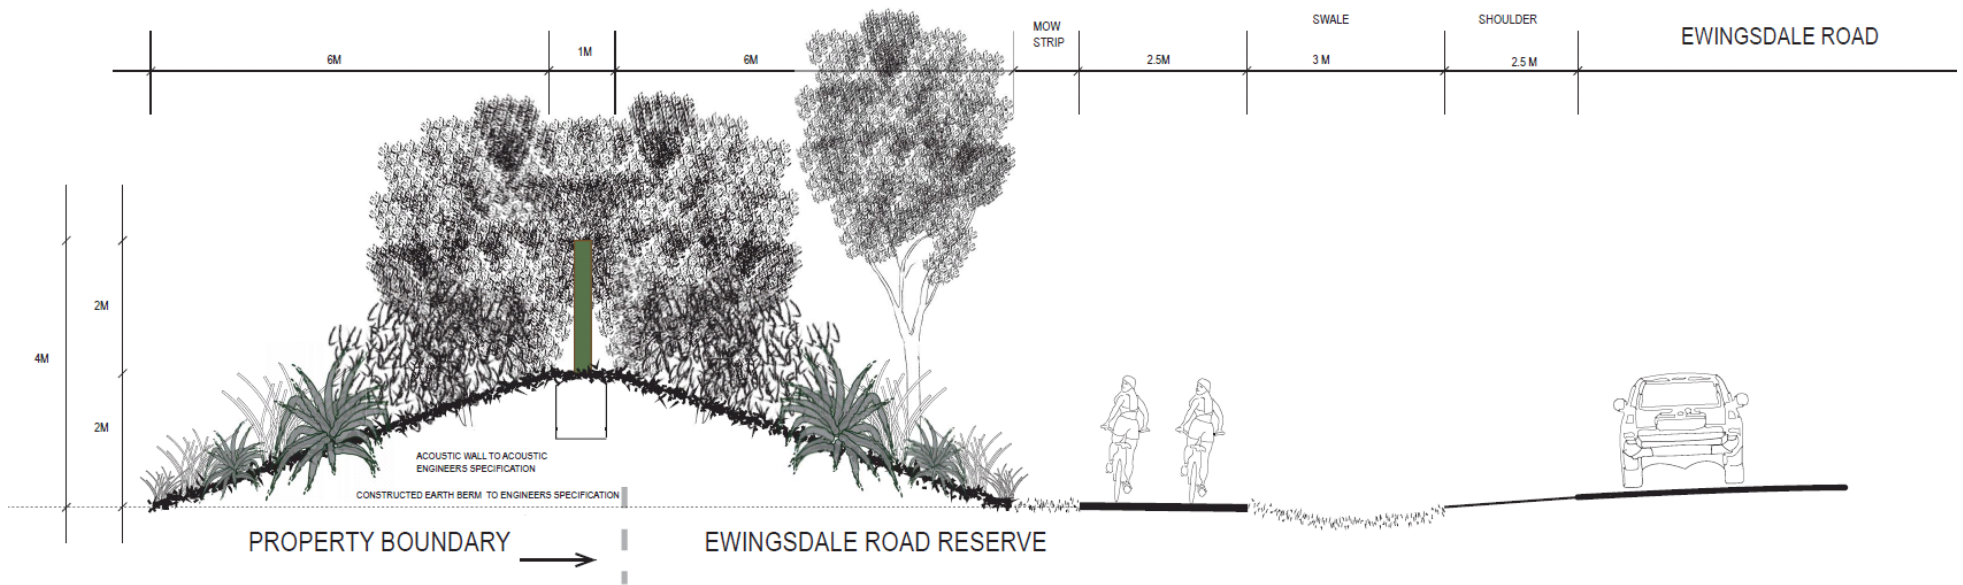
Landscape Buffer and Acoustic Barrier to Ewingsdale Road
